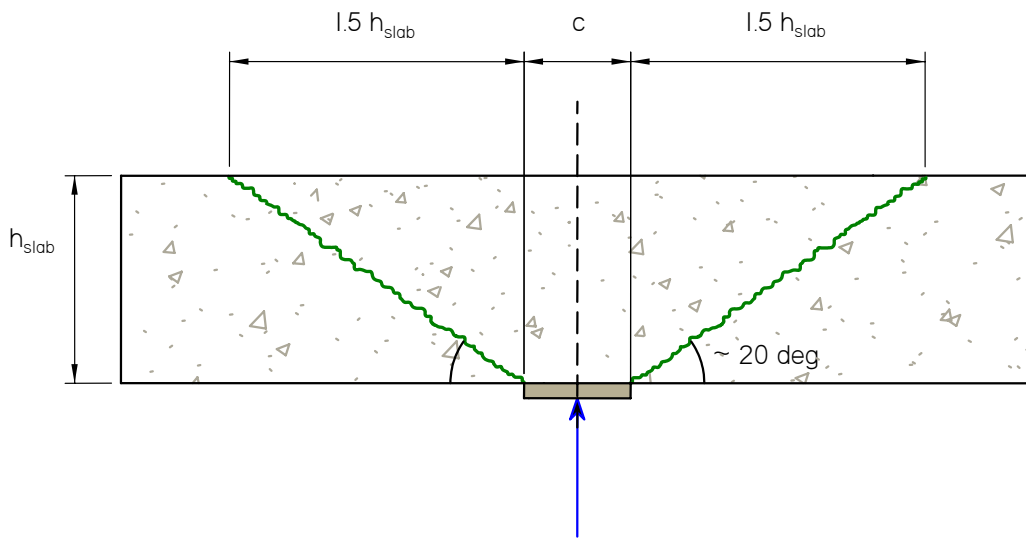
Ductal® Breakout (Punching Shear) Failure Surface
